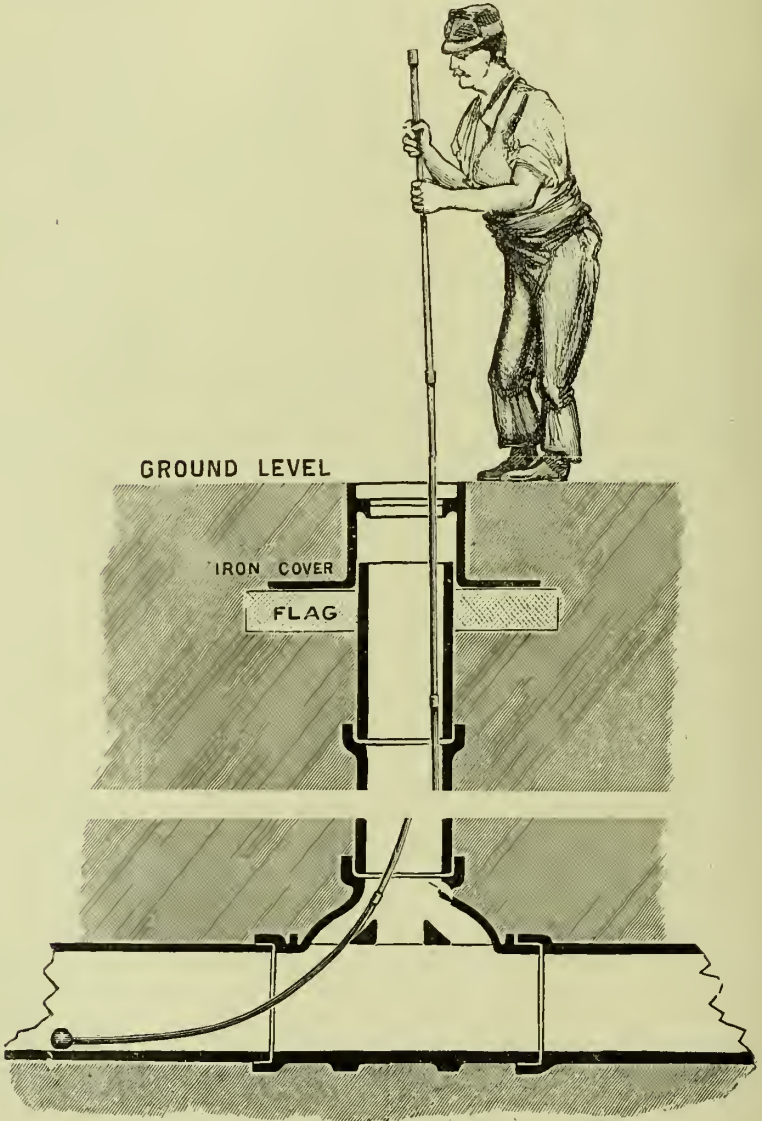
Access pipe as fixed to sewer, with 9-inch pipe shaft.
